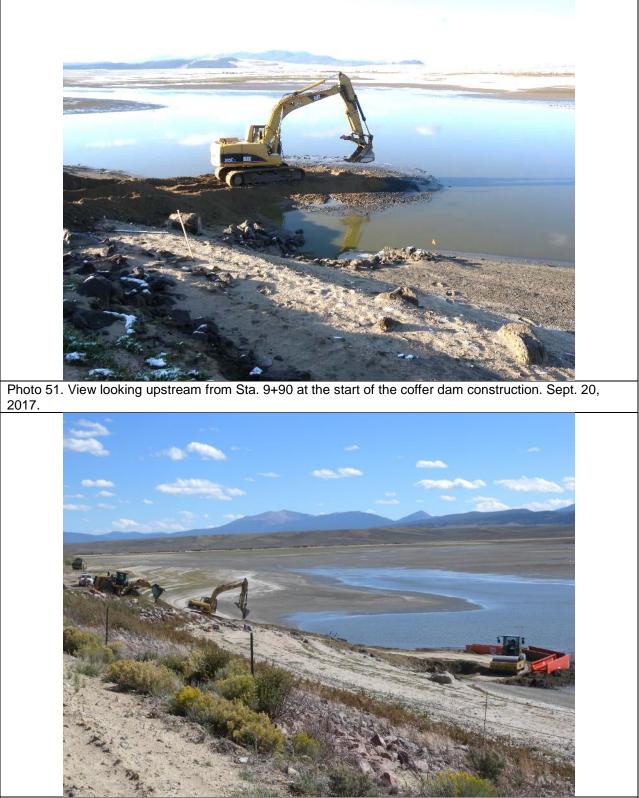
View looking upstream from Sta. 10+50 at the trench boxes and work on the coffer dam as well as construction of the temporary access road and platforms for the dewatering pumps on the upstream side of the reservoir. Sept. 20, 2017.
